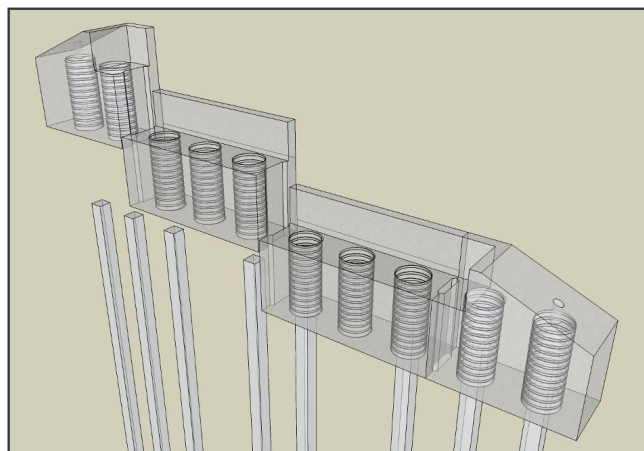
Precast abutment wall segments with embedded corrugated pipes⁵⁶
